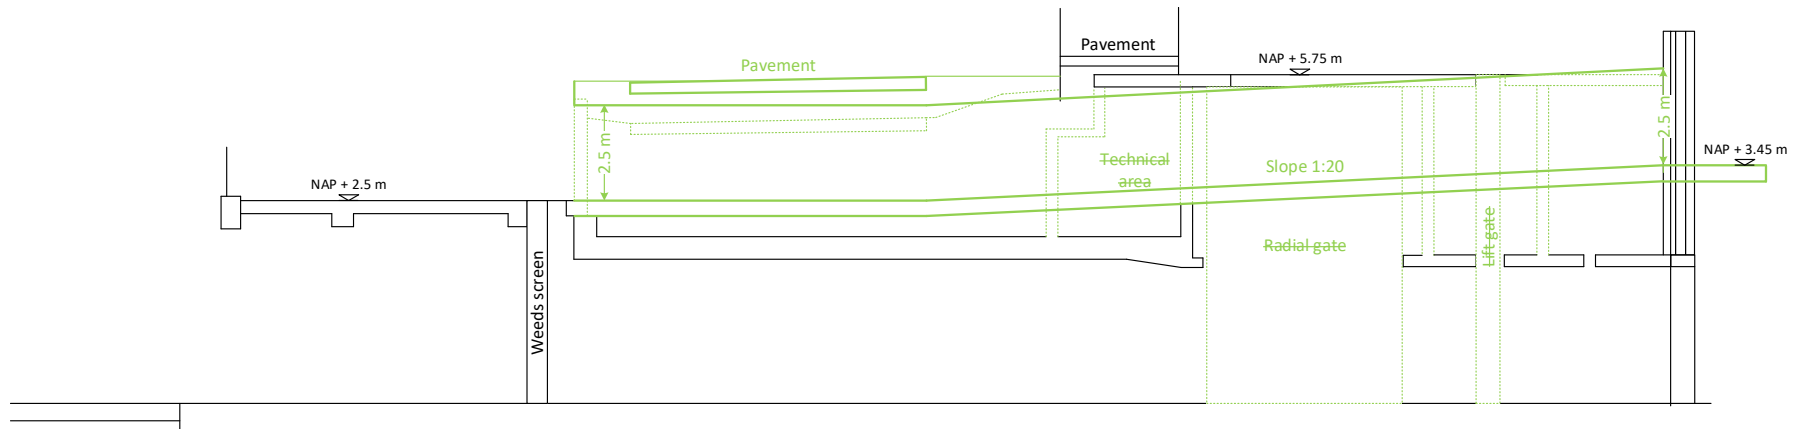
Sketch of a pedestrian tunnel with a slope of 1:20 above culvert number 2
